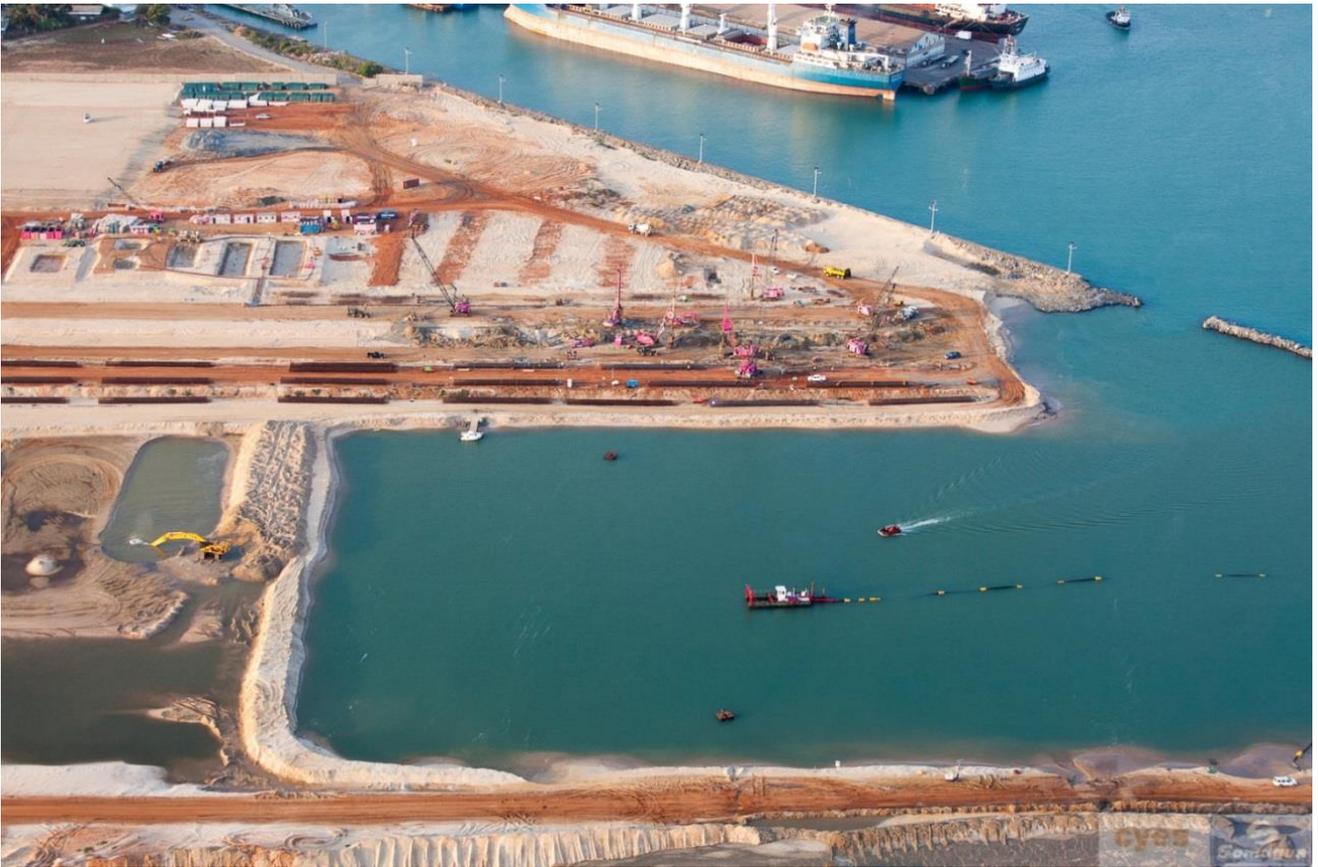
East part of the new basin with reinforcement cages ready to be installed. November 2013.
